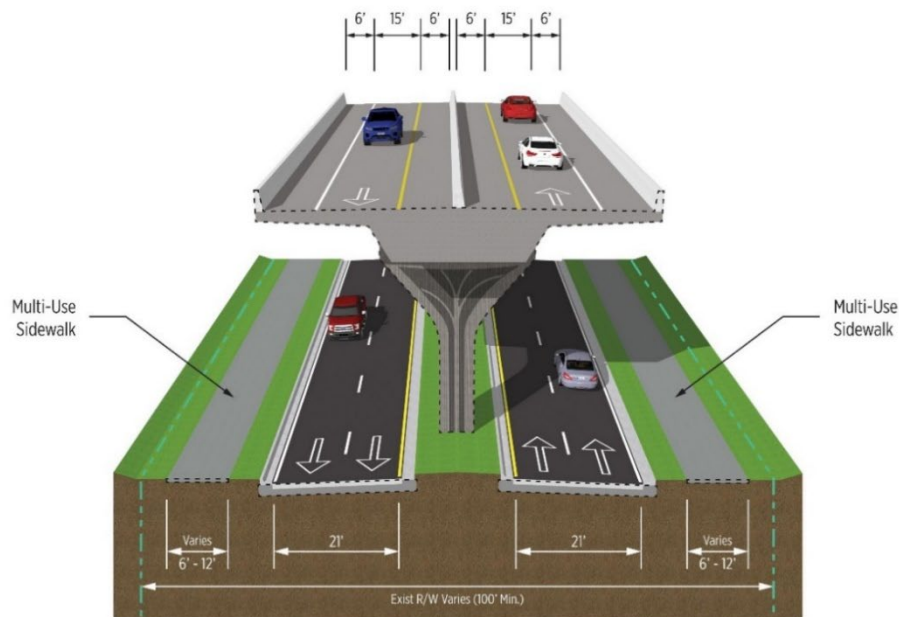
Segment 3 – Typical Section 5 from East End of the Gandy Bridges to Approximately 1,800 Feet West of Bridge Street
